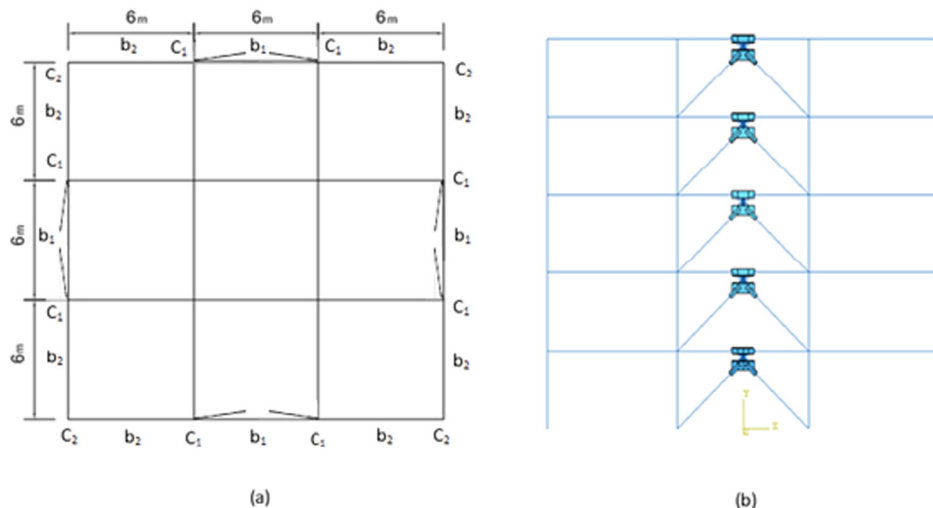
Schematic of modelled structure. (a) Plan. (b) Elevation.
